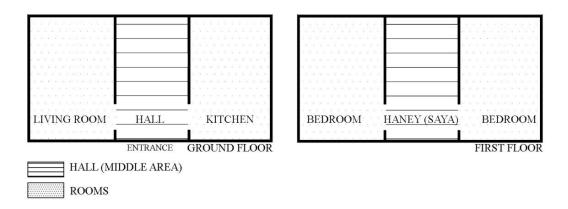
Common house plan scheme in Inner Castle area (S. Sevimbige archive, 2018)
